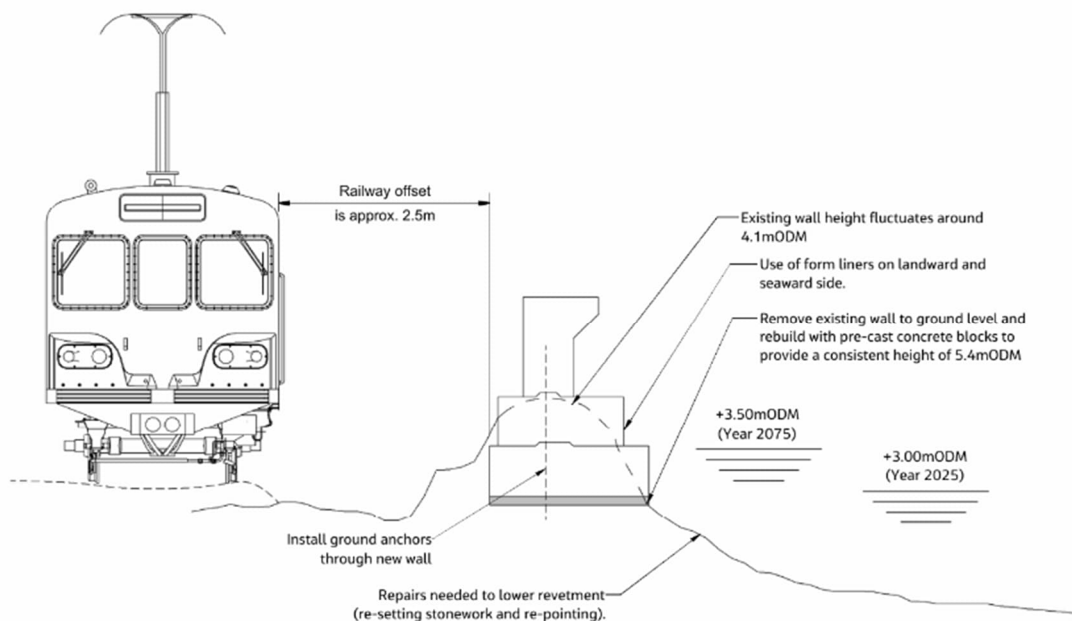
Typical section: Wall on existing concrete base with existing wall demolished
